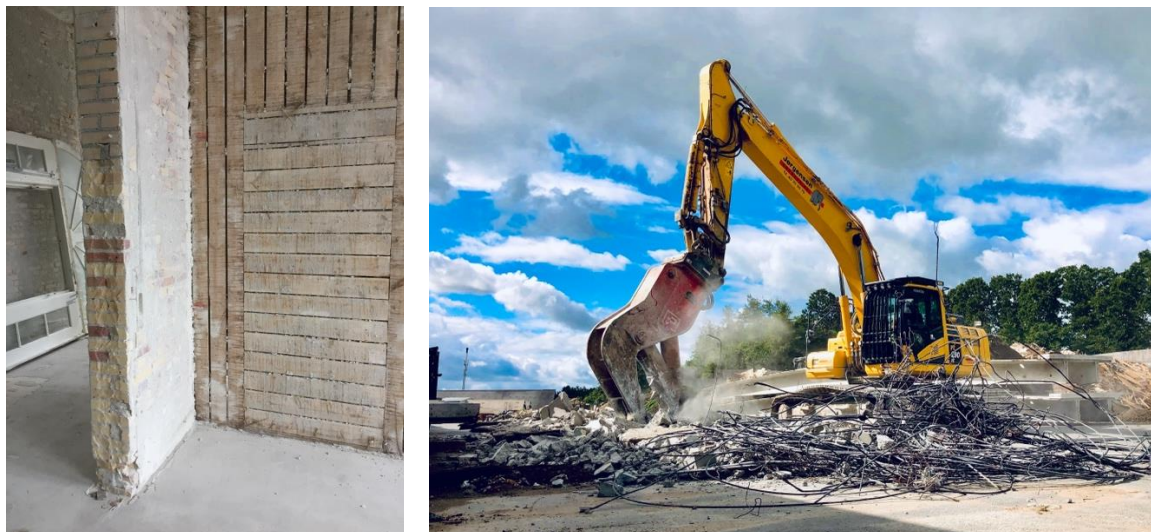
Surface covering is removed from walls and floors prior to further demolition and deconstruction (to the left), reinforced concrete is separated into concrete and metal fractions on site (to the right) (Source: Danish Technological Institute)
